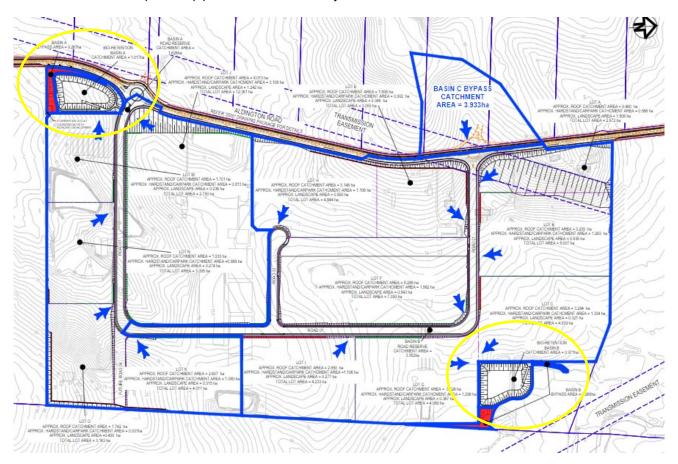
Proposed stormwater catchment plan (bio-detention basins shown in yellow) Source: AT&L
